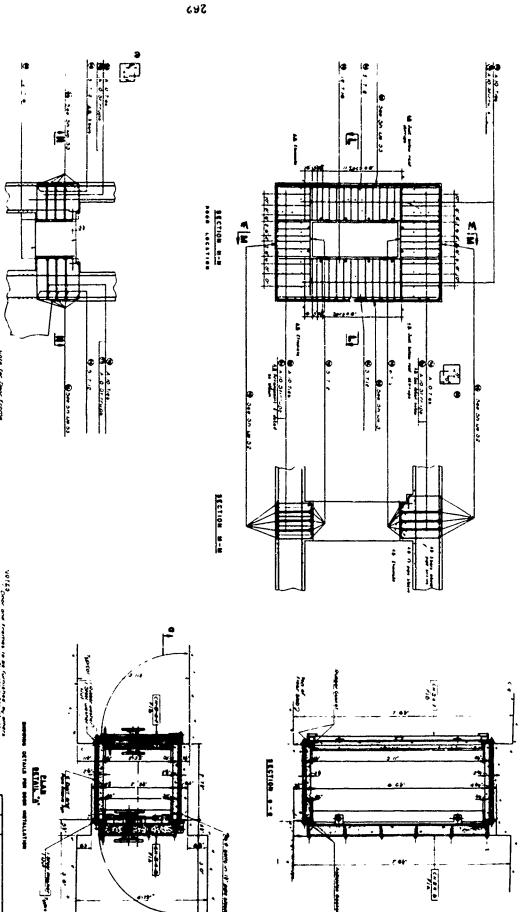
Entrance and entrance chamber, type 65, structure II-4, reinforcement for ventilation
